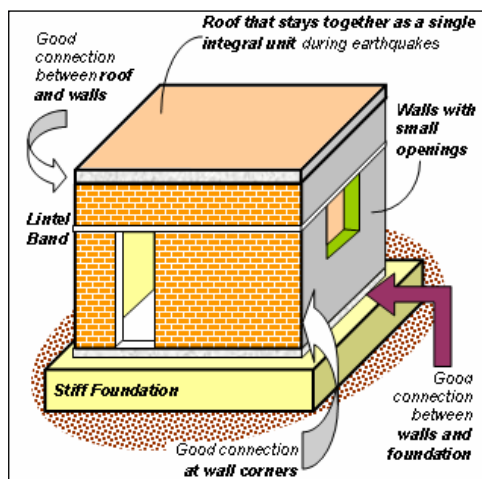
Properly Connected Load Bearing Walls of a Masonry Building
